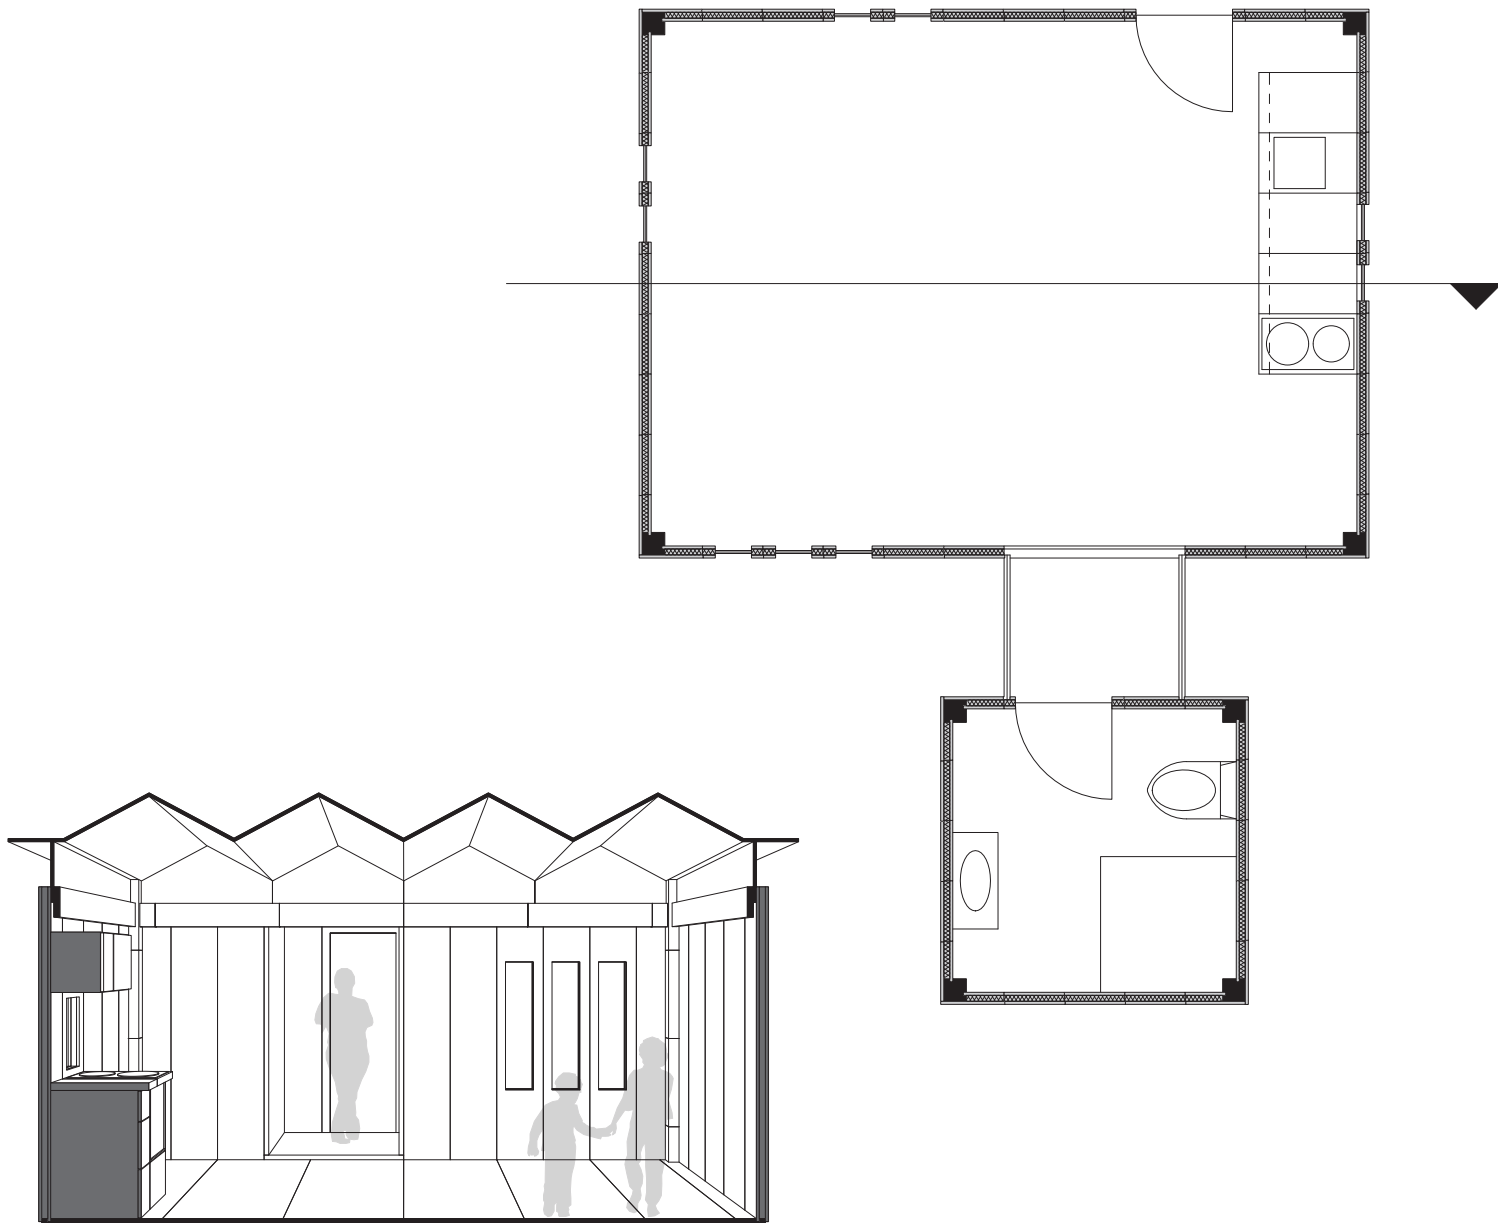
Plan and section at 1:50. The bathroom module is attached to the transitional house via a linking module. This linking module replaces three cladding panels. With a lowered ceiling height, it plugs into the transitional house, creating a passage way without doubling up on walls. The same system is used for all additional modules.
